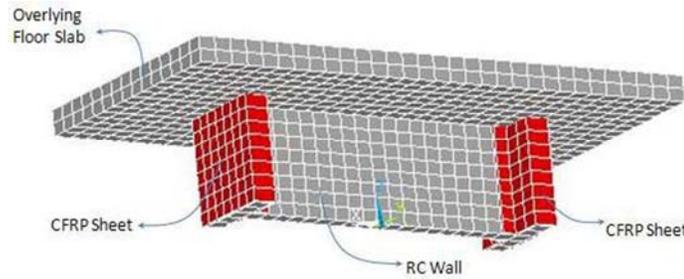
Finite Element model of RC walls externally bonded with FRP sheets.
